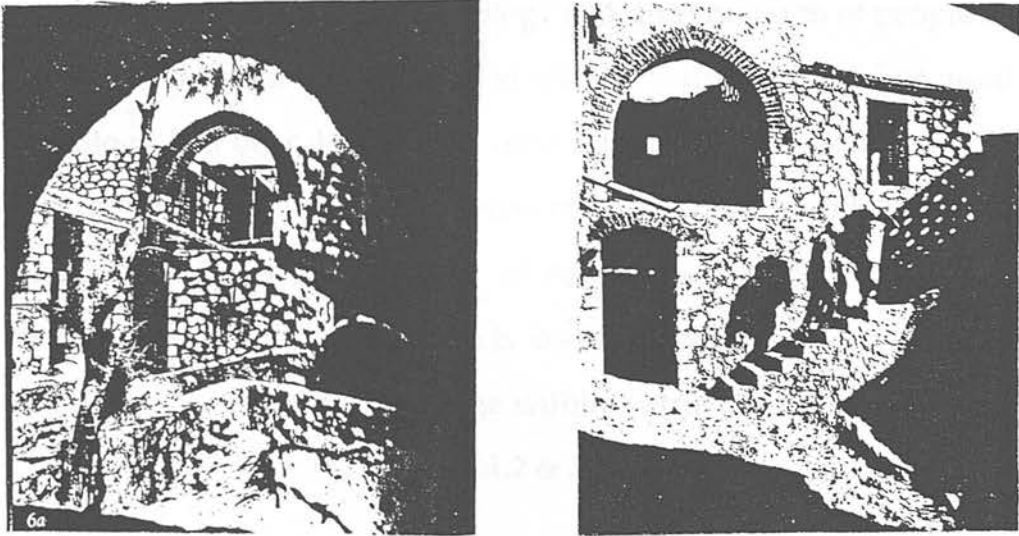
Masonry construction as a successful system for bearing walls with vaults and domes
